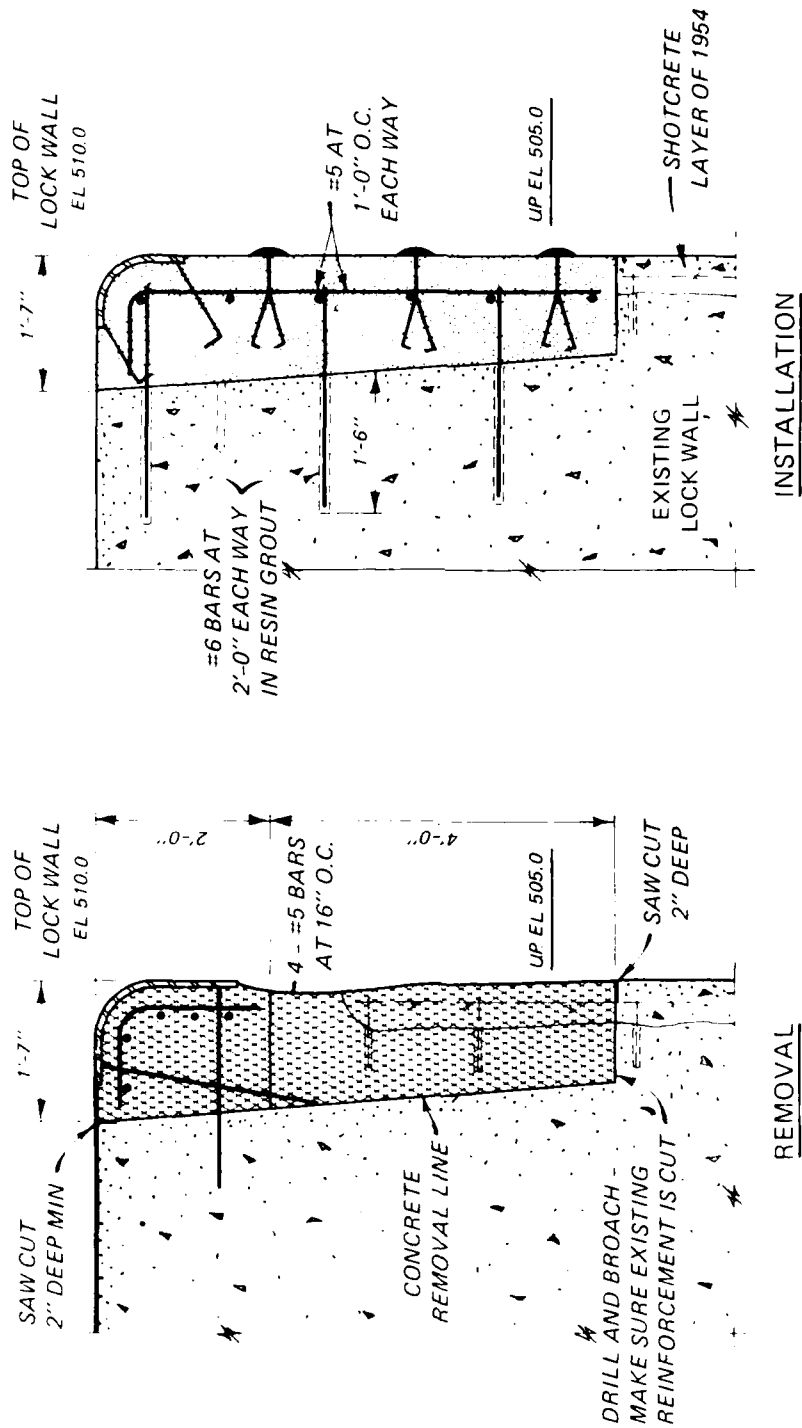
Armor installation in portions of lock wall previously resurfaced with shotcrete, Dresden Island Lock
